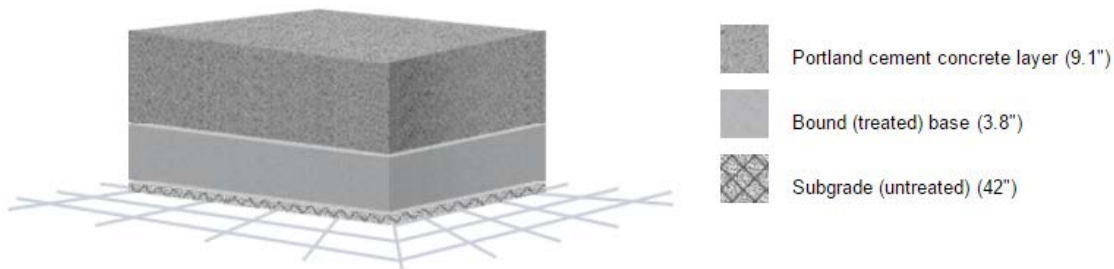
Pavement structure of LTPP Segment 40-4157
